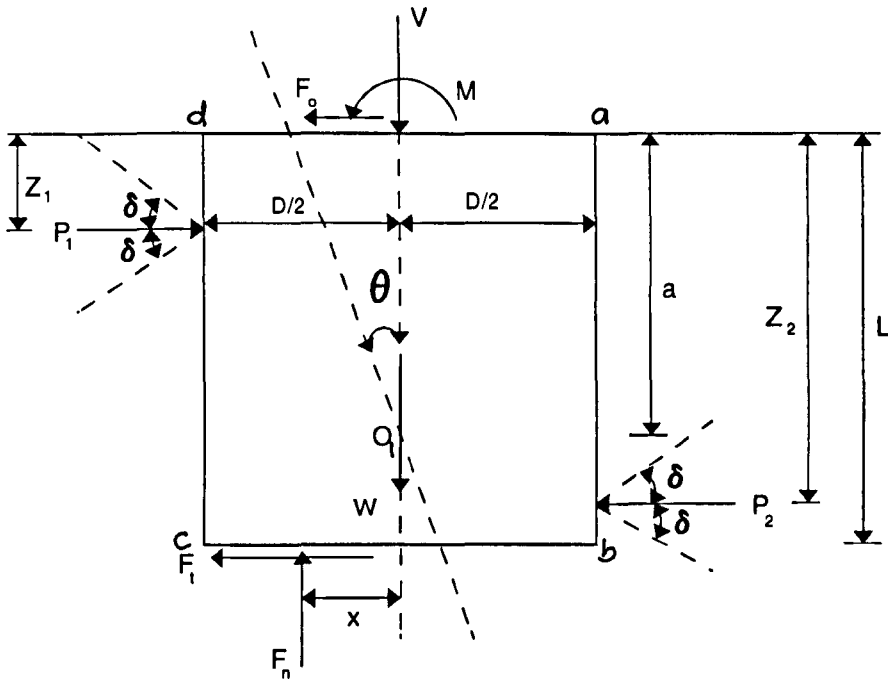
Details of forces acting on the short pier foundations by Roscoe(1957).
